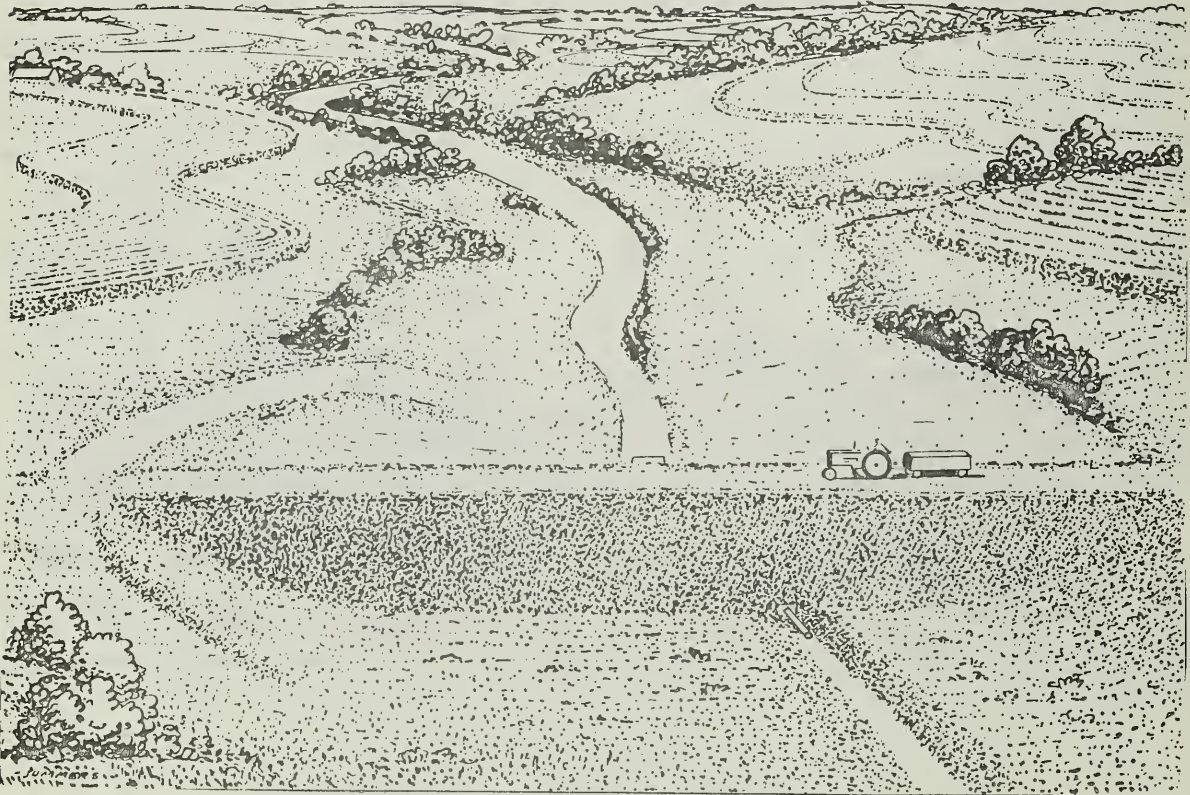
FLOOD RETARDING DAM-DRY POOL
